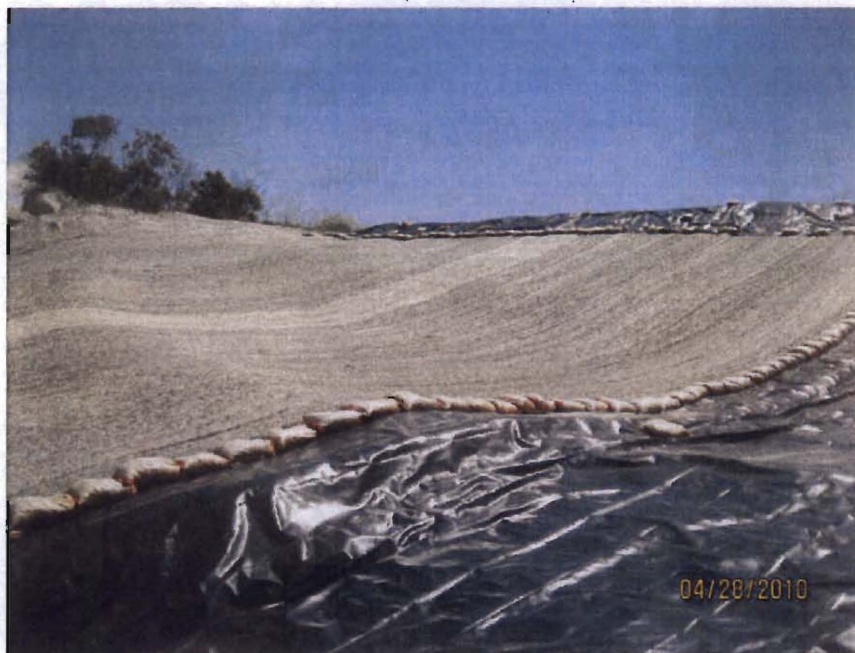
Jute net slope protection and temporary down drain on slope descending from pad 8
